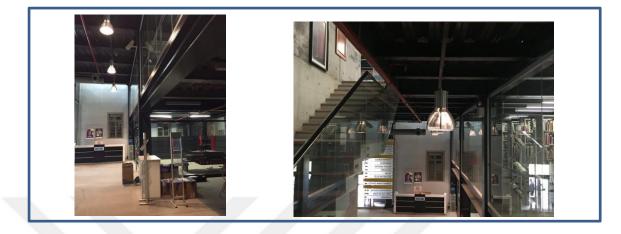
View of Black Steel Beams Use in Unit Framings
